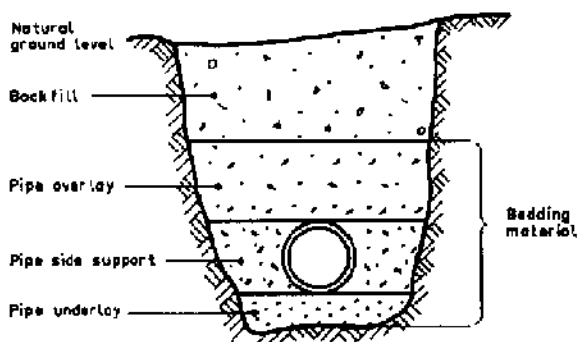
LAYERS IN A TRENCH INSTALLATION
